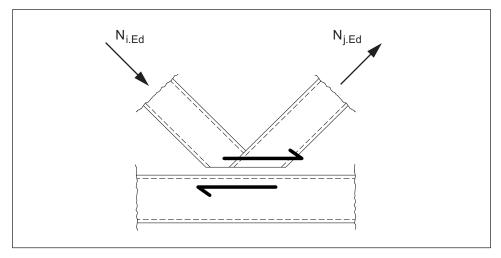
Overlap joint. Shear of the brace members off the chord
